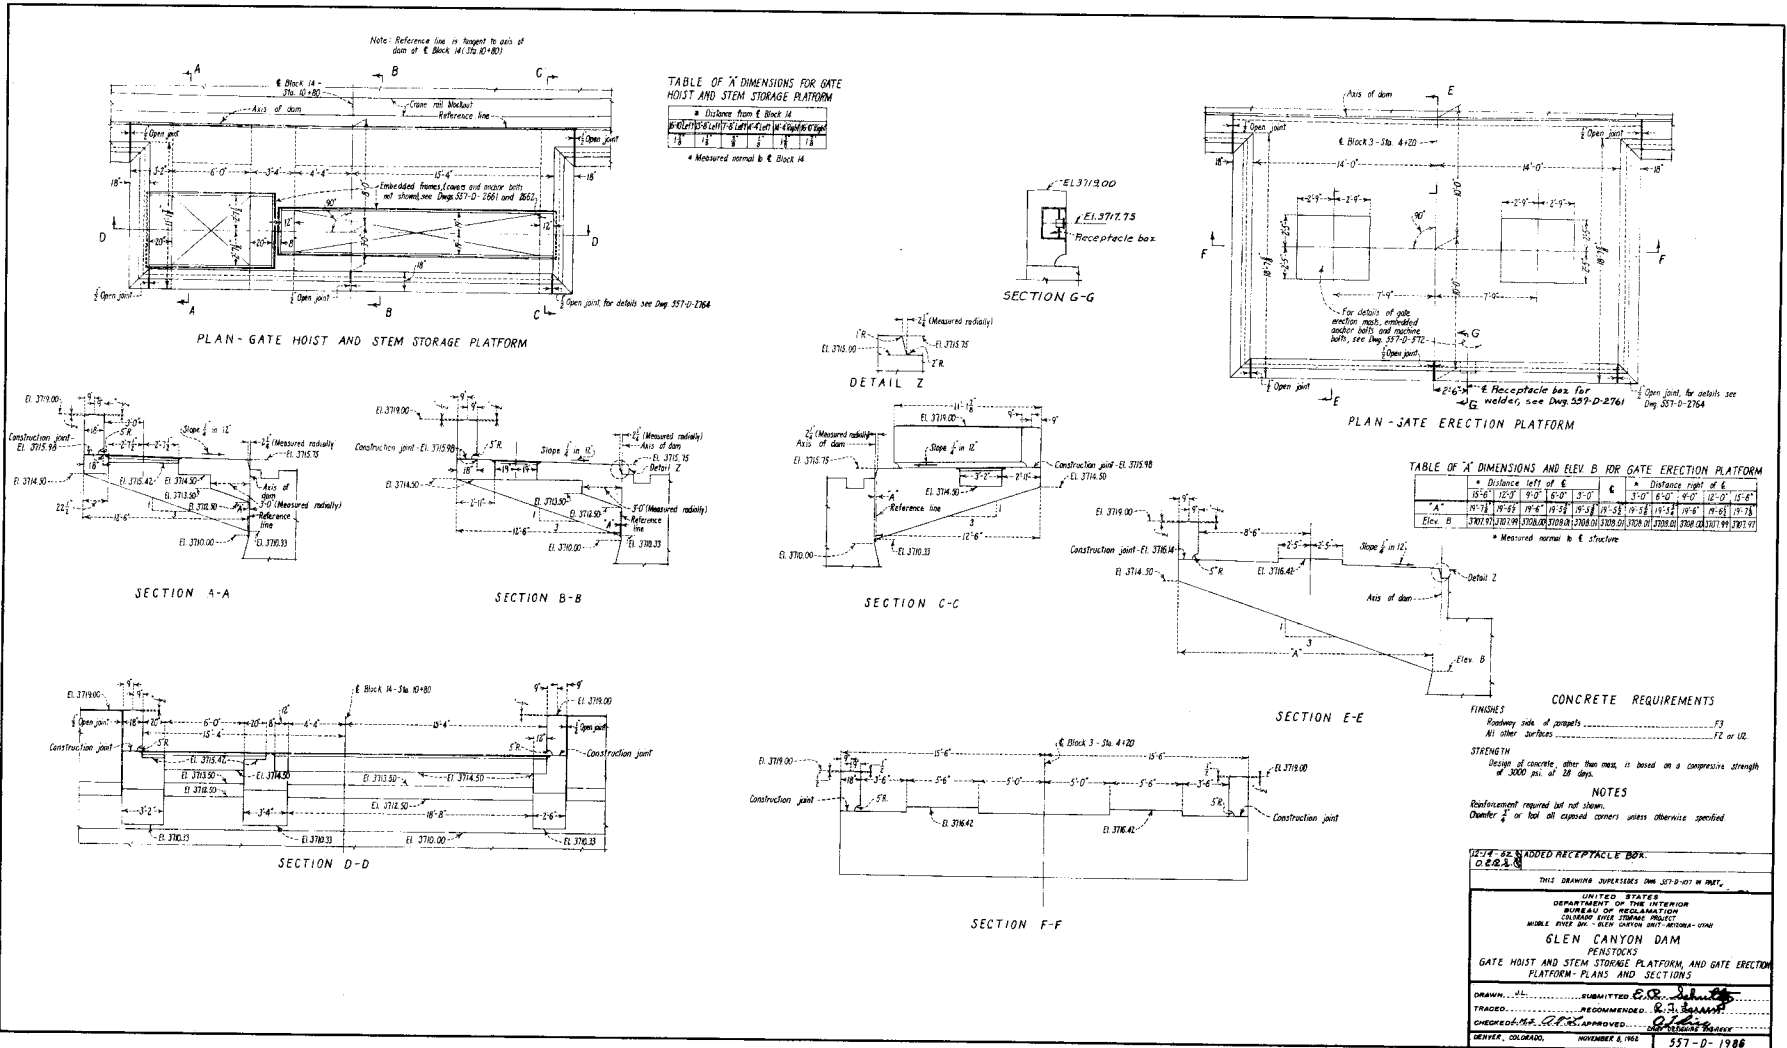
Penstocks gate hoist and stem storage platform, and gate erector platform—Plans and sections.
